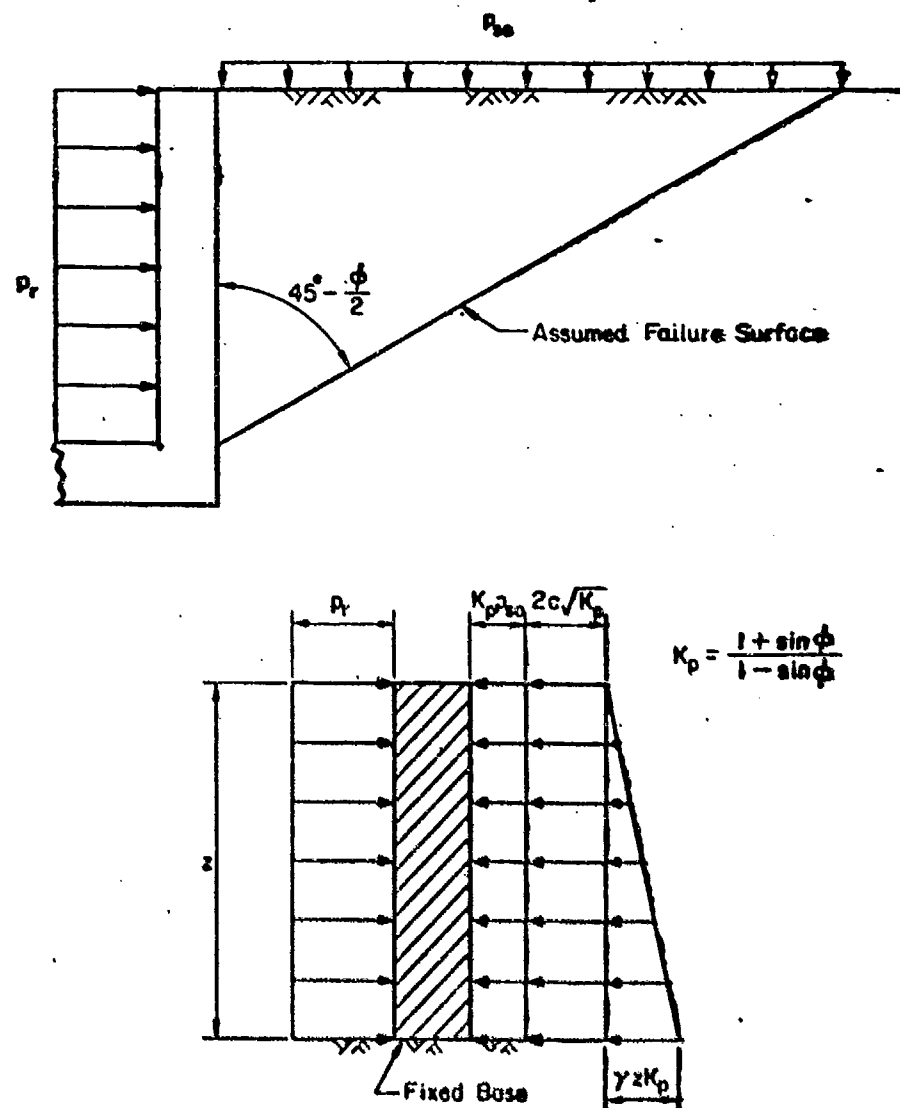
PRESSURES ACTING ON VERTICAL WALL ADJACENT TO OPEN
